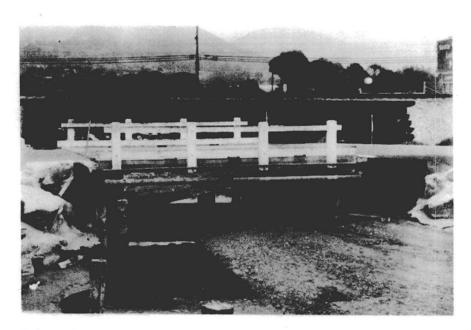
Padaro Lane bridge over Arroyo Paredon (looking upstream at river mile 0.09).
